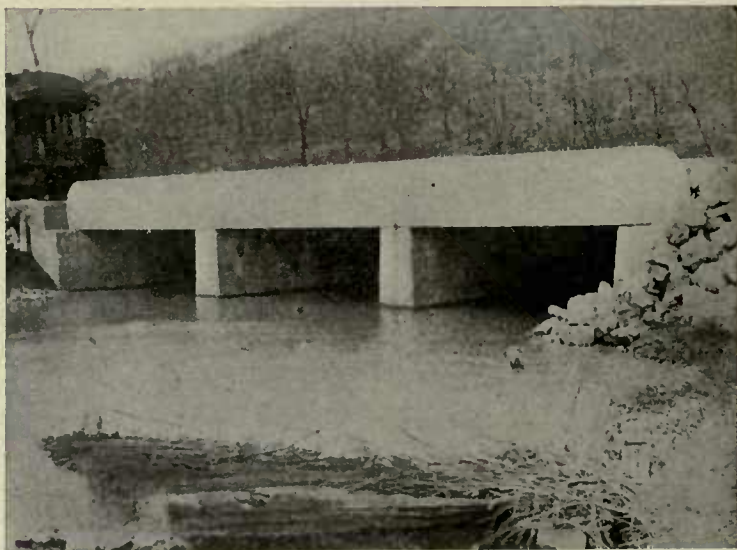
THROUGH GIRDER, CONCRETE TRESTLE ON PIERS.
